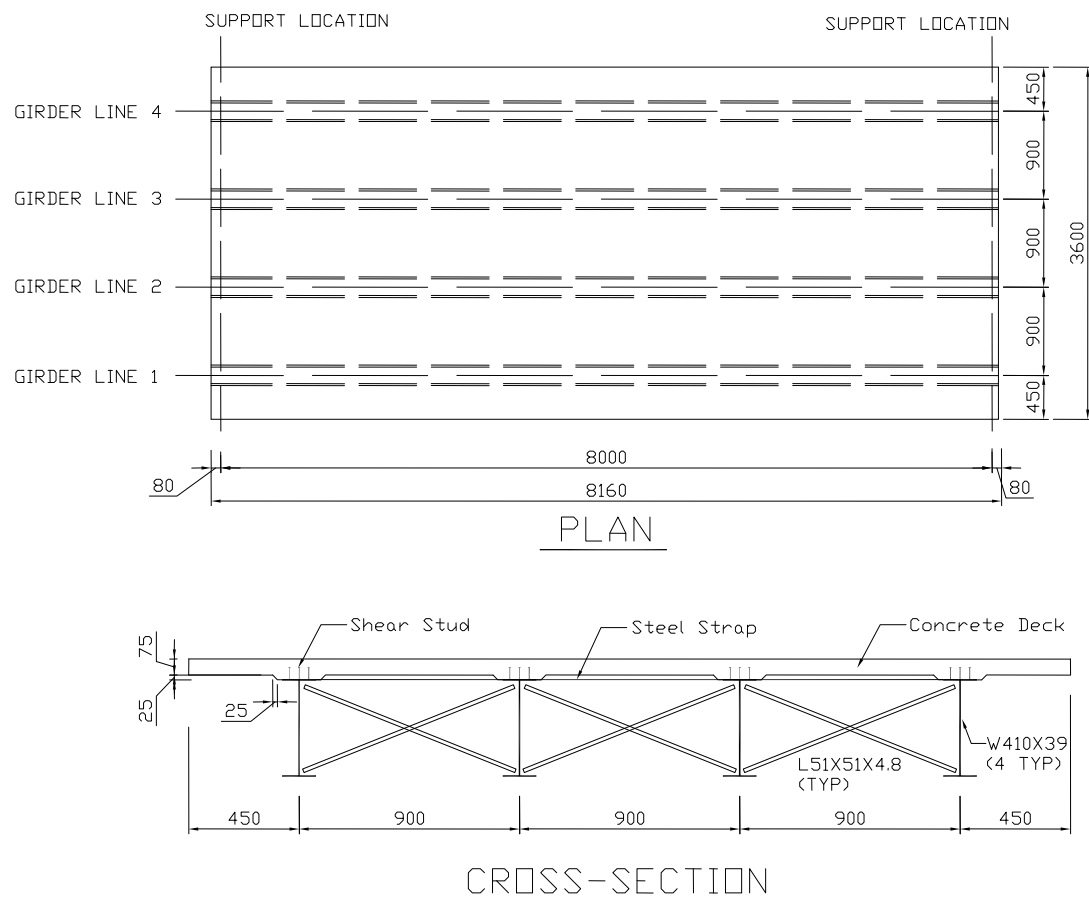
Plan and cross-section view of the composite bridge deck showing the structural components and general layout (dimensions in mm).
